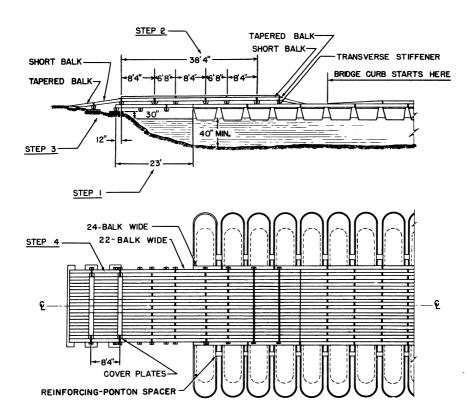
Twenty-three-foot end span with a 38-foot superimposed end span.
